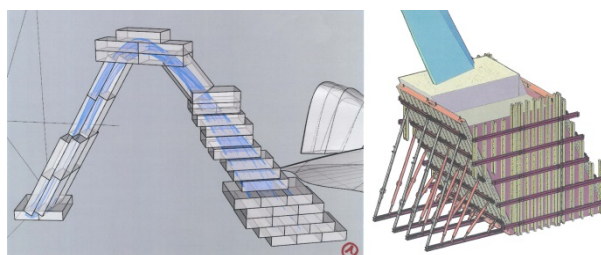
Formwork and scaffolding for a cast in-situ high performance concrete construction of Glorious Arch, approx. 17m high
